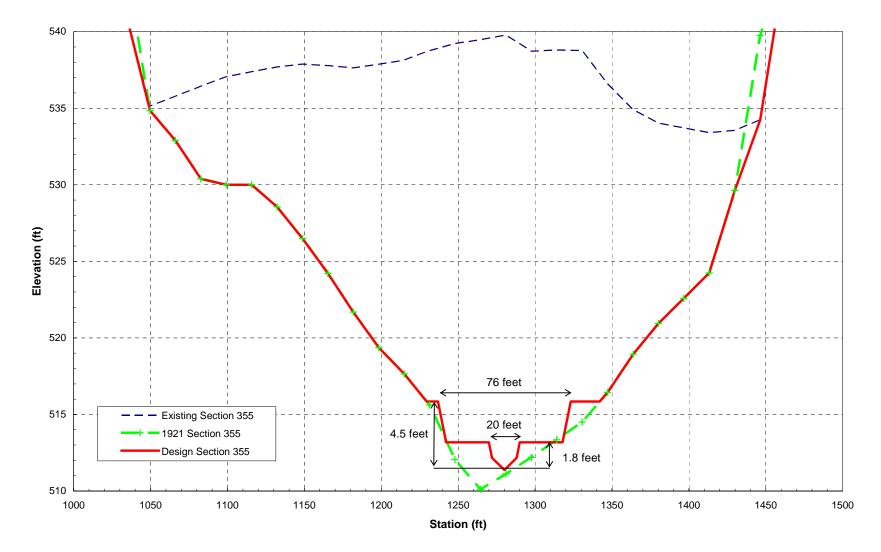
Typical cross section and design channel geometry (upstream from the intersection with the pre-dam surface) for the reconstructed reach of the Carmel Branch under the Notching Alternative.
